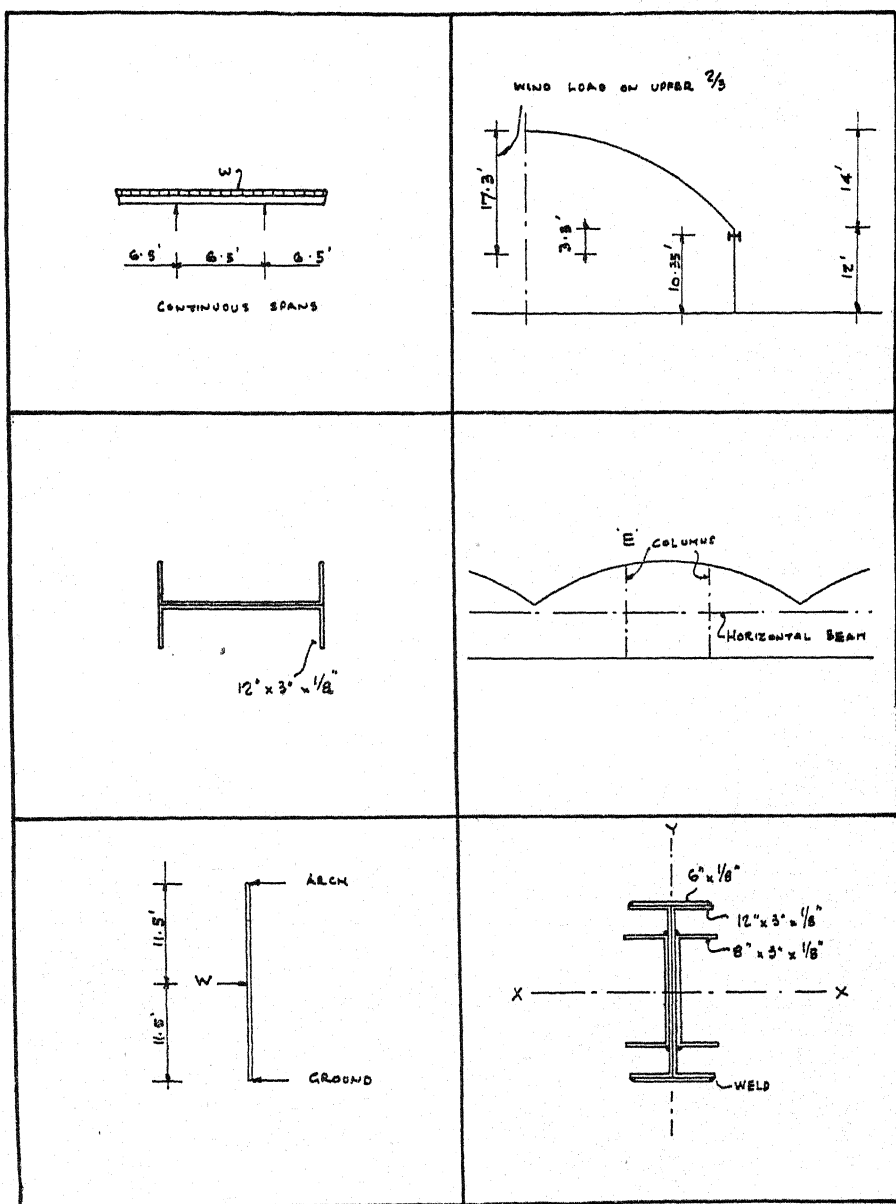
, (upper left)—wall load on horizontal wind beam, 360-foot walls. Fig. 20, (upper right)—wind load diagram, 240-foot walls. Fig. 21, (center left)—section of horizontal wind beam, 240-foot walls. Fig. 22, (center right)—wind load diagram for "E" columns. Fig. 23, (lower left)—application of wind load on "E" columns. Fig. 24, (lower right)—section of "E" columns.
